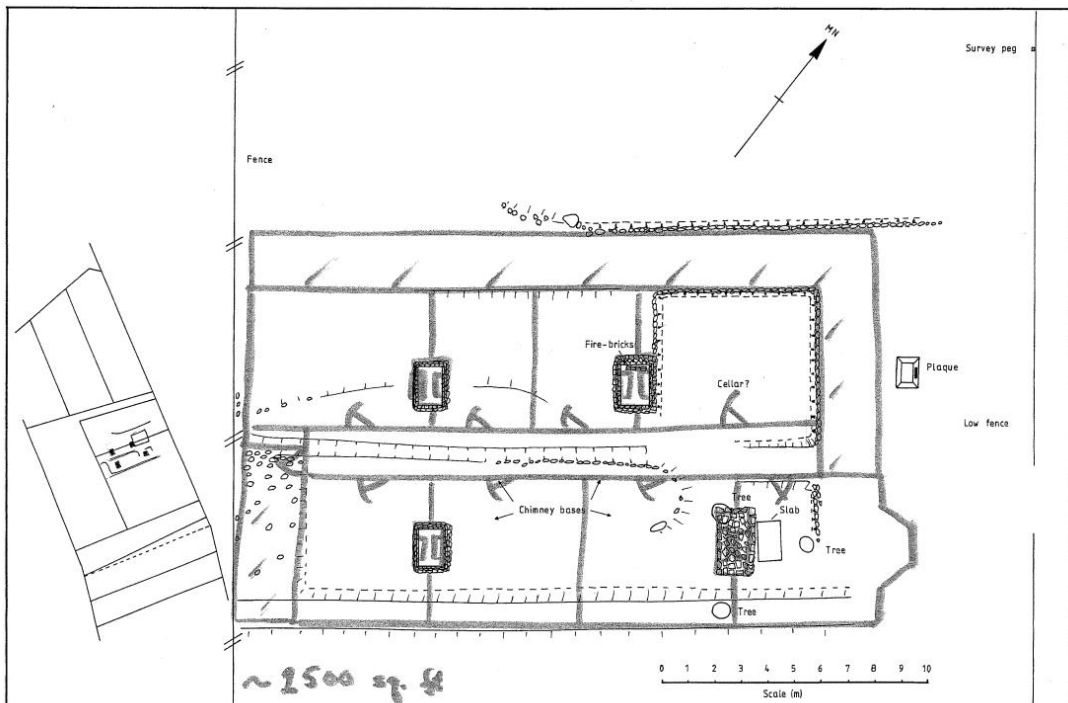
Conjectural drawing of likely house site floor plan overlaid on archaeological site plan, not dated (HNZPT File 13002-115).
